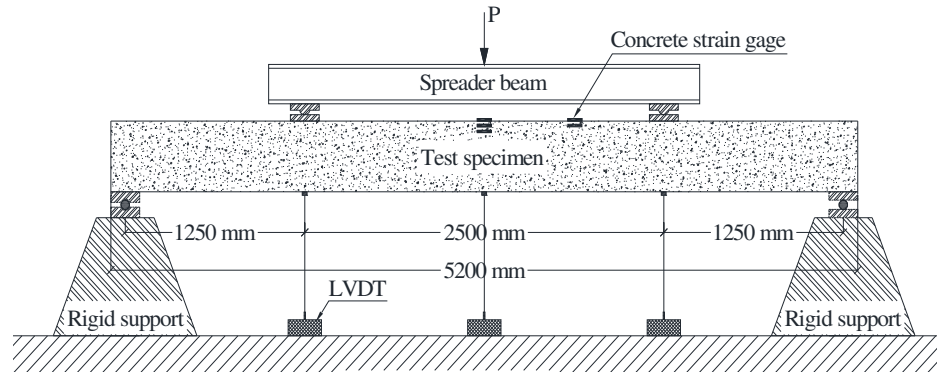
Test setup, and location of LVDTs and concrete strain gages
